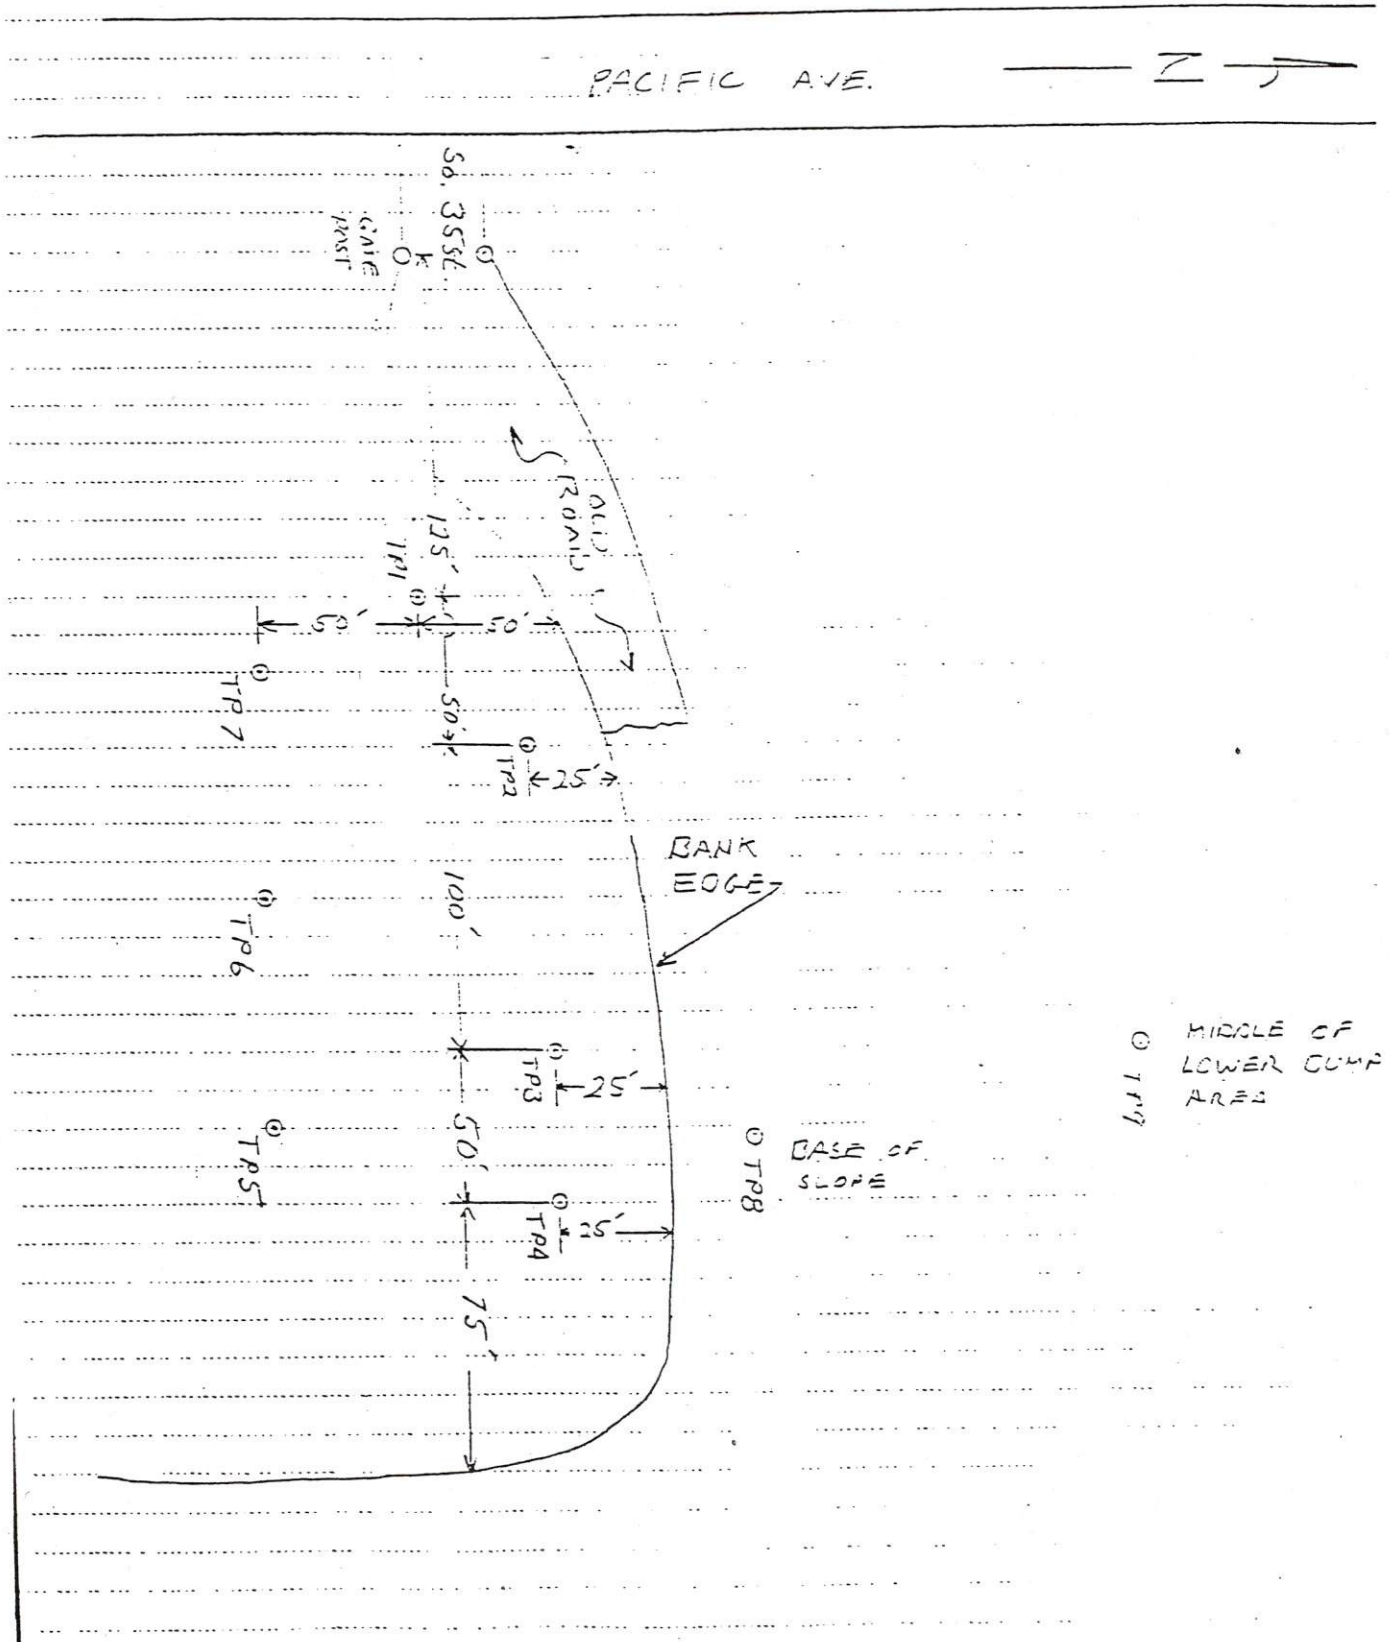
TEST PIT LOCATION 35TH STREET GULCH
